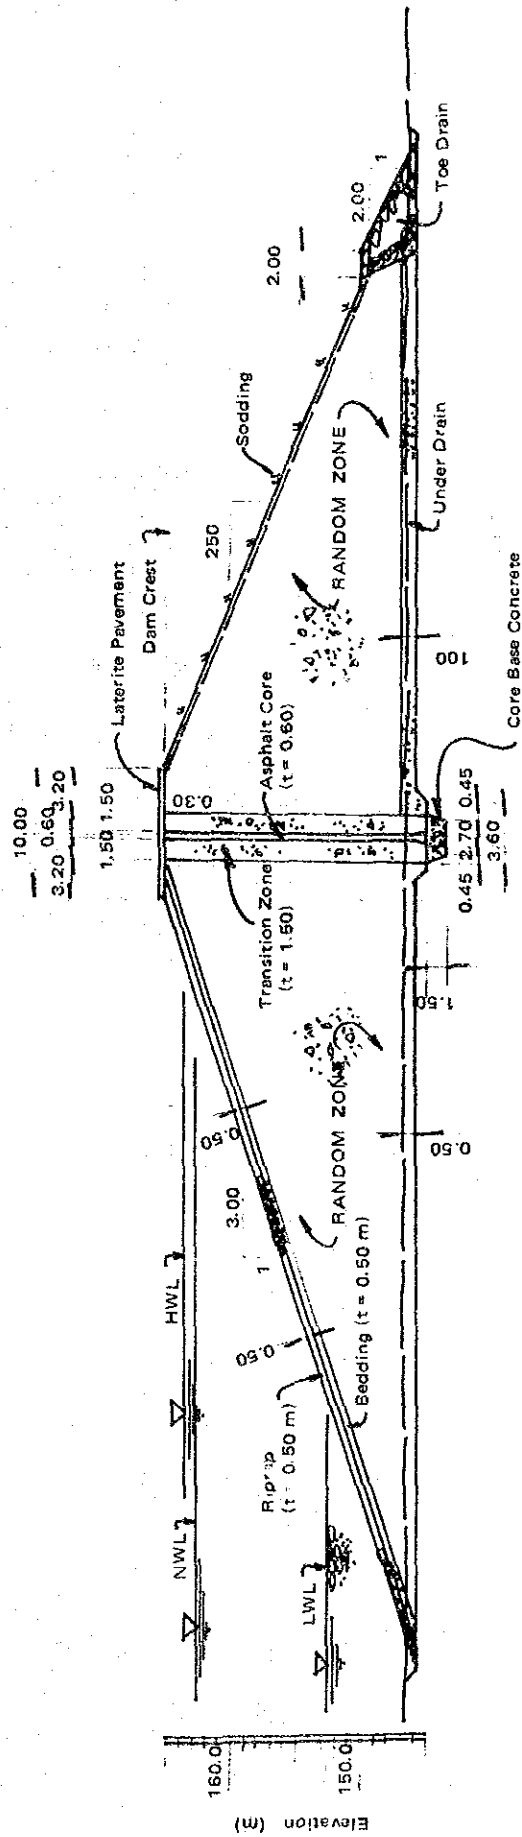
TYPICAL SECTION OF EACH TYPE DAM (4/4)
